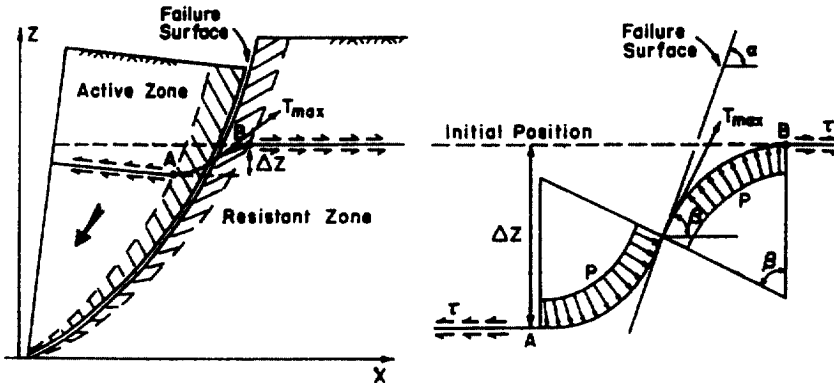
Anchored membrane concept for geotextile reinforcement (Gourc et al., 1986).
